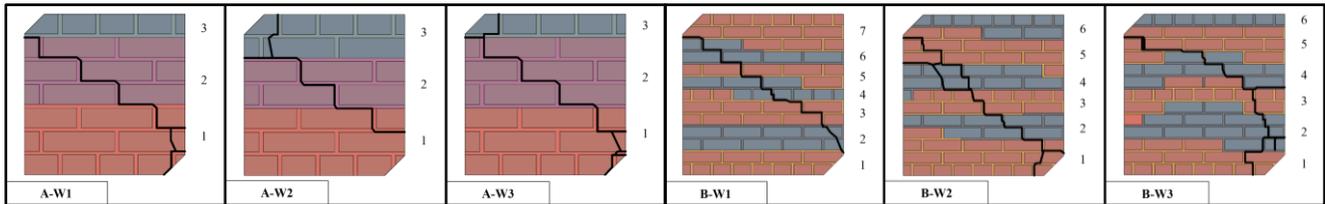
Cracking patterns of wallets A and B samples for diagonal tension tests
